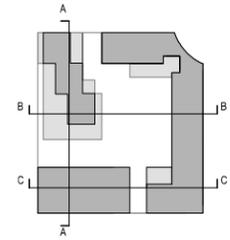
(a): SITE SECTIONS
